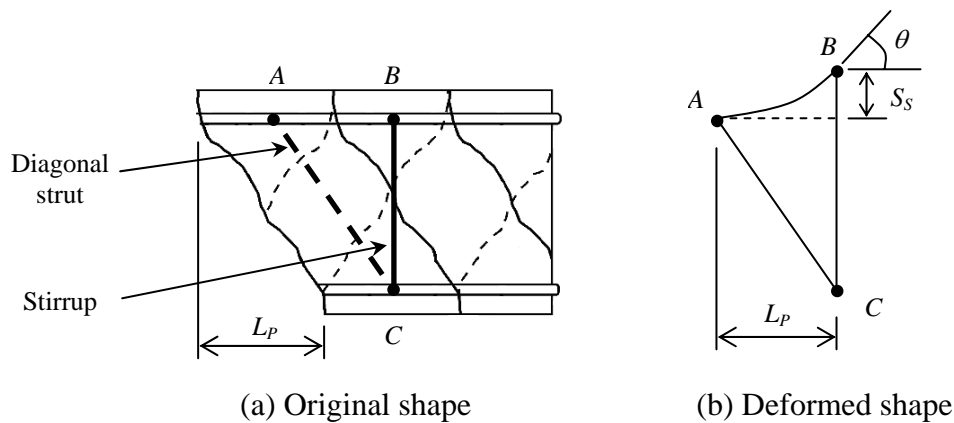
Extension of stirrup due to rotation of the plastic hinge
